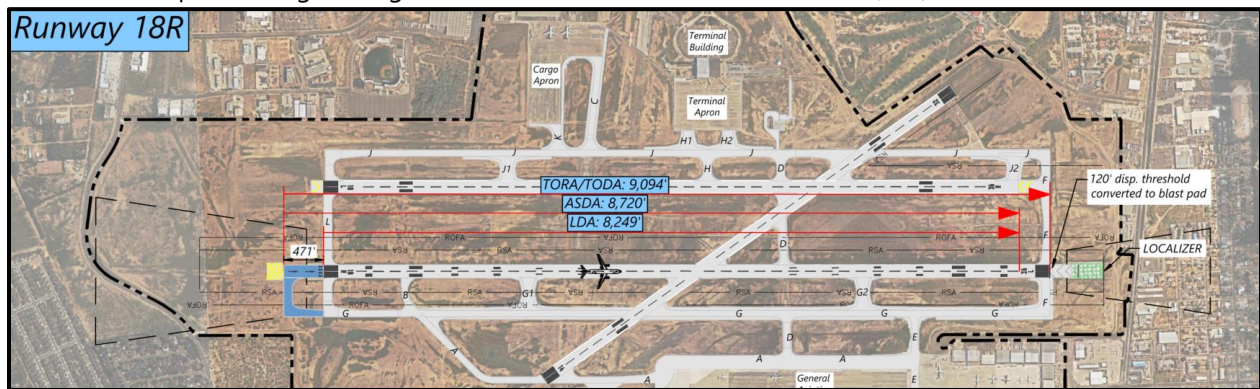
RUNWAY 18R EXTENSION AND SUPPORTING DEVELOPMENT
